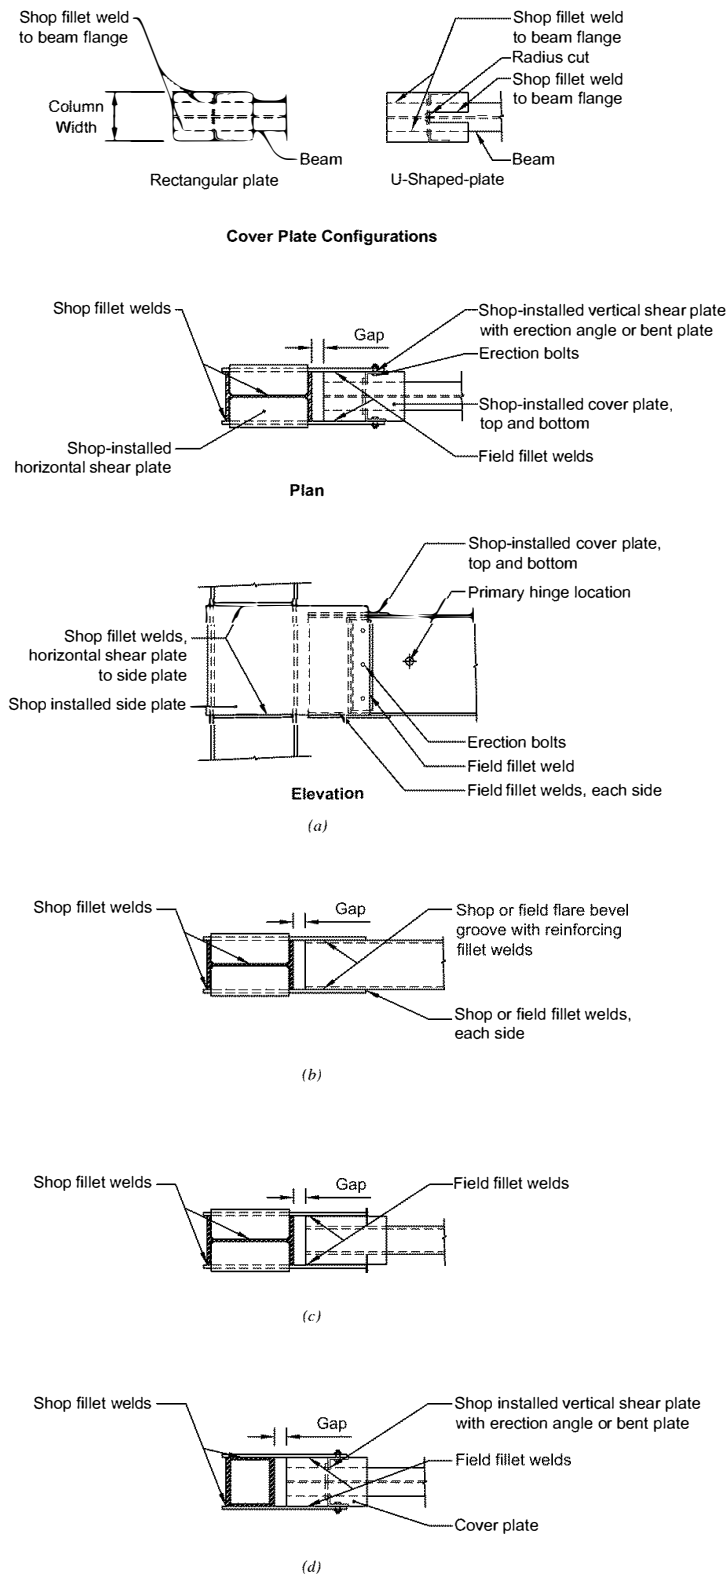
SidePlate uniaxial configuration geometry and major components: (a) typical wide-flange beam to wide-flange column, detail, plan and elevation views; (b) HSS beam without cover plates to wide-flange column, plan view; (c) HSS beam with cover plates to wide-flange column, plan view; and (d) wide-flange beam to built-up box column, plan view.
